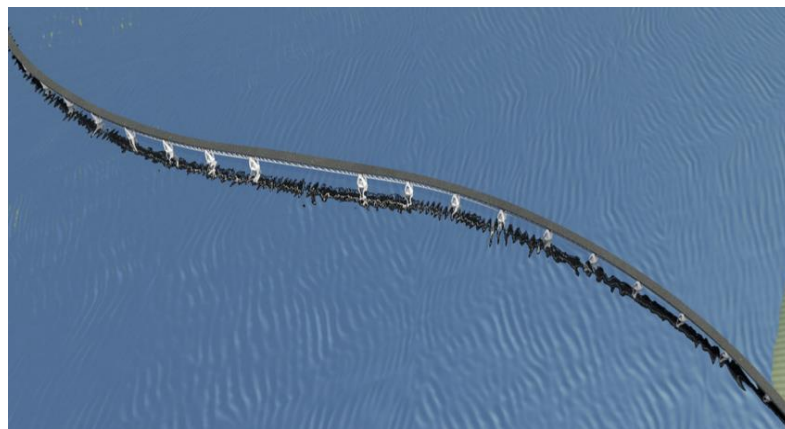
TOP VIEW: VARYING BRIDGE DECK WIDTH ALONG THE BRIDGE LENGTH [38]
